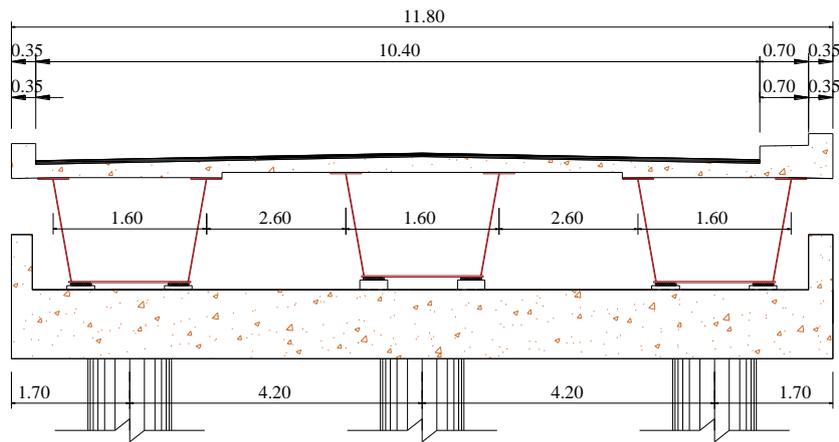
A cross-sectional view of the composite steel box girder bridge
